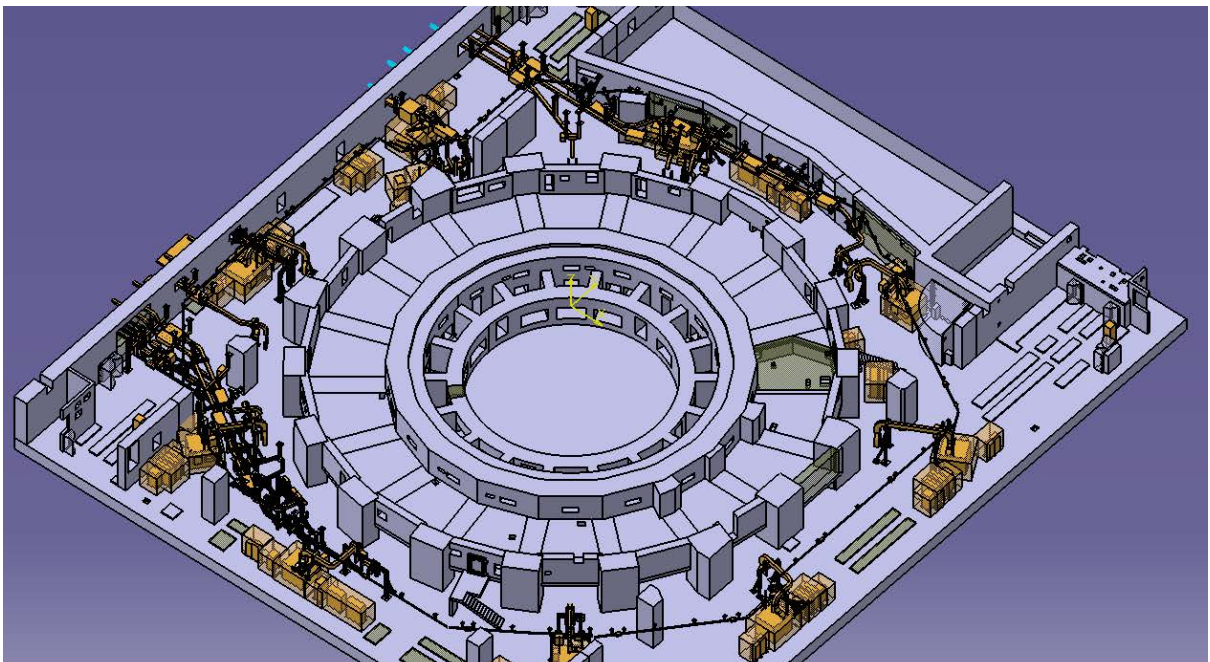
Layout of the Busbars in Building 11. Level B2. [8]
